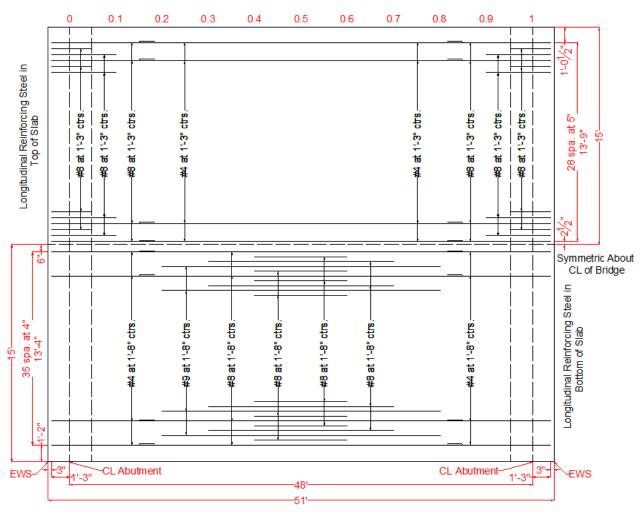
shows the reinforcement design for the 48-ft. haunched-slab section in plan view.
